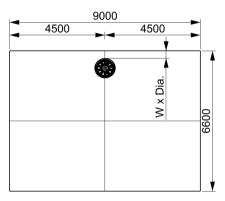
Tunnel cross-section, with a fan below the soffit (all dimensions in mm)
